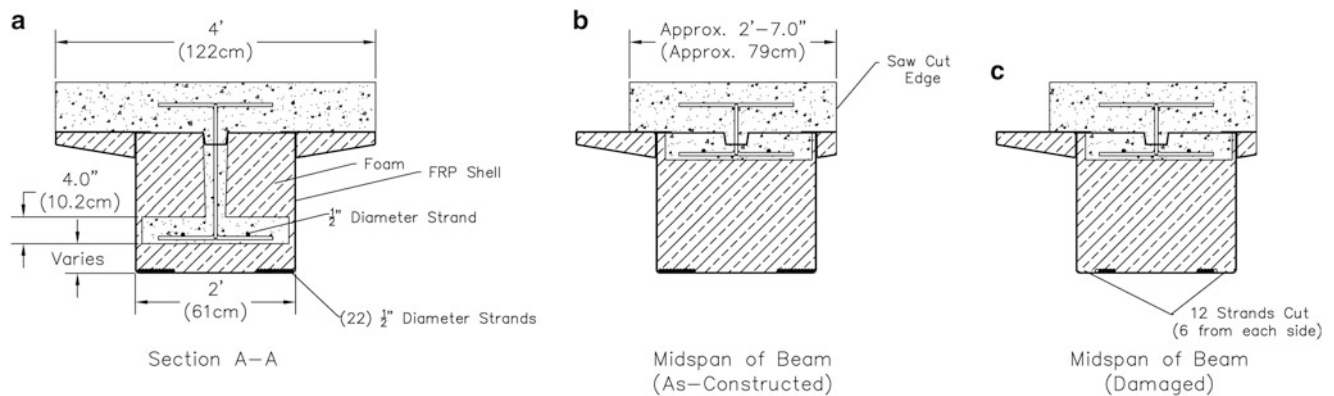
Cross section of HCB beam: (a) typical cross sectional design; (b) typical cross section of tested beam indicating saw cut edge; (c) midspan cross section of tested beam after introduced damage
